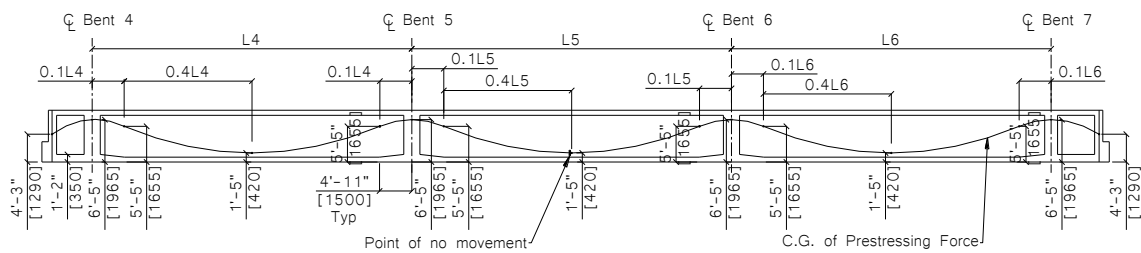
Prestressing tendons profile in Frame 2, Bridge 1
